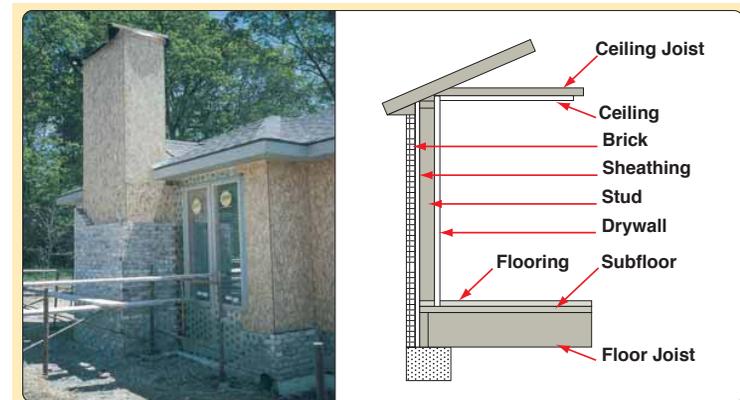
This is a cross-section diagram of a finished wall. The photo shows brick being applied as a siding material.
